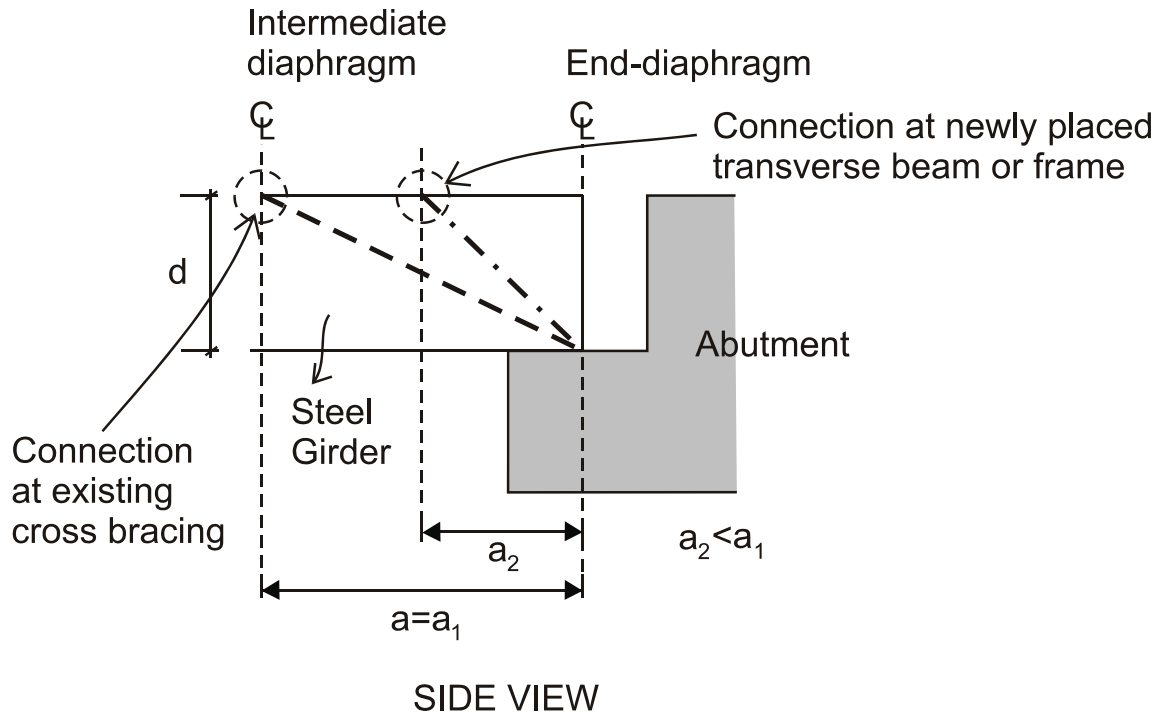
Connection of Unbonded Braces to Bridge Deck
